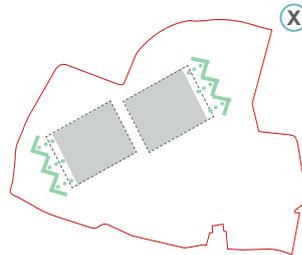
Shortened length, allowing widened edge planting to south west and north east.
